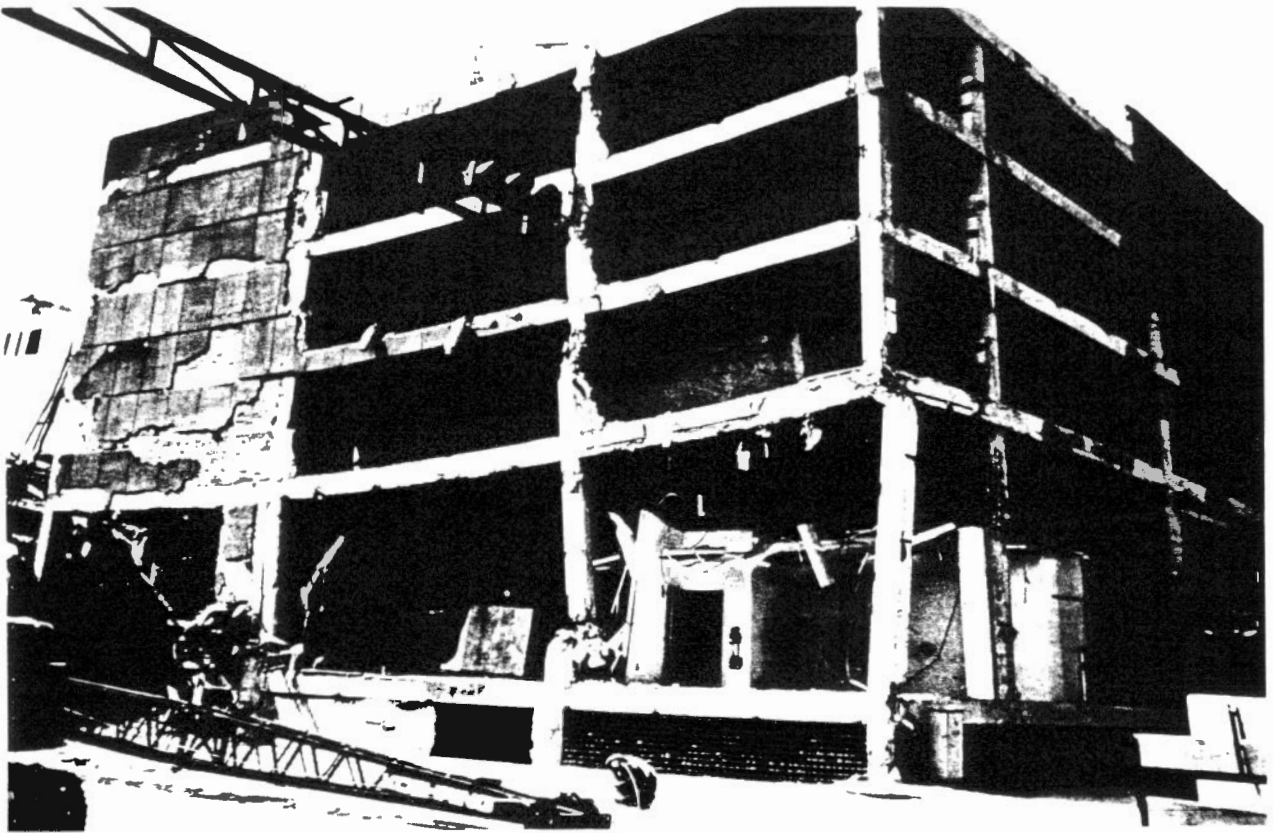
and 6.19b Four Storey Theatre with Reinforced Concrete Frame and Masonry Infilled Walls
